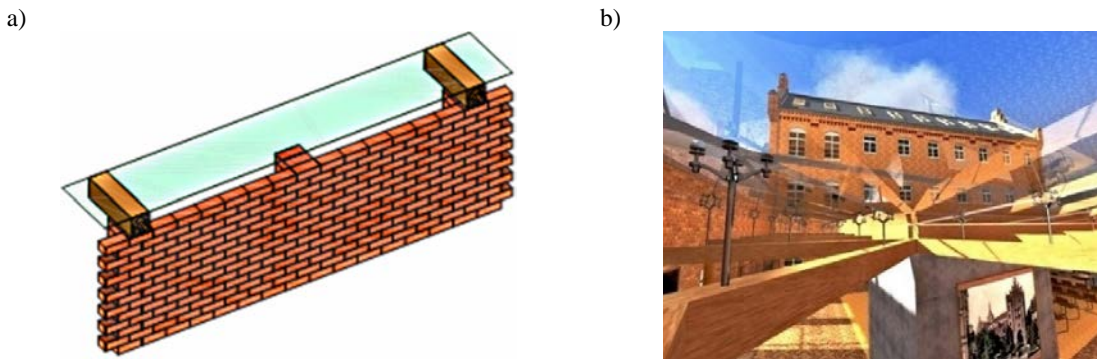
Perimeter wall encircling the courtyard: (a) model of supporting glazed roof, (b) detail of placing glazed roof surfaces on the wooden beams.
